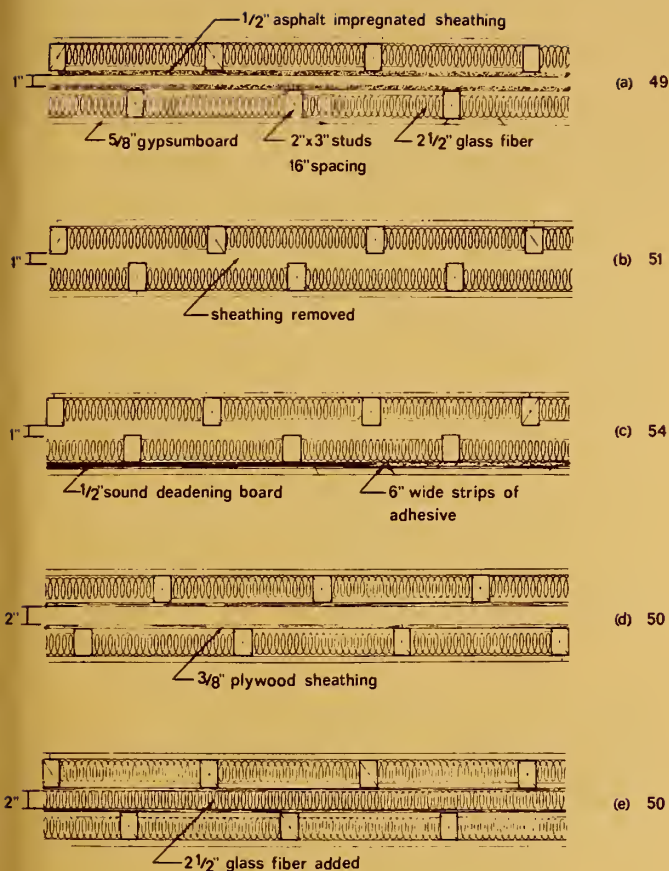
Construction of the wall as formed in the field (a) and as modified in four ways for laboratory testing (b, c, d, e).
